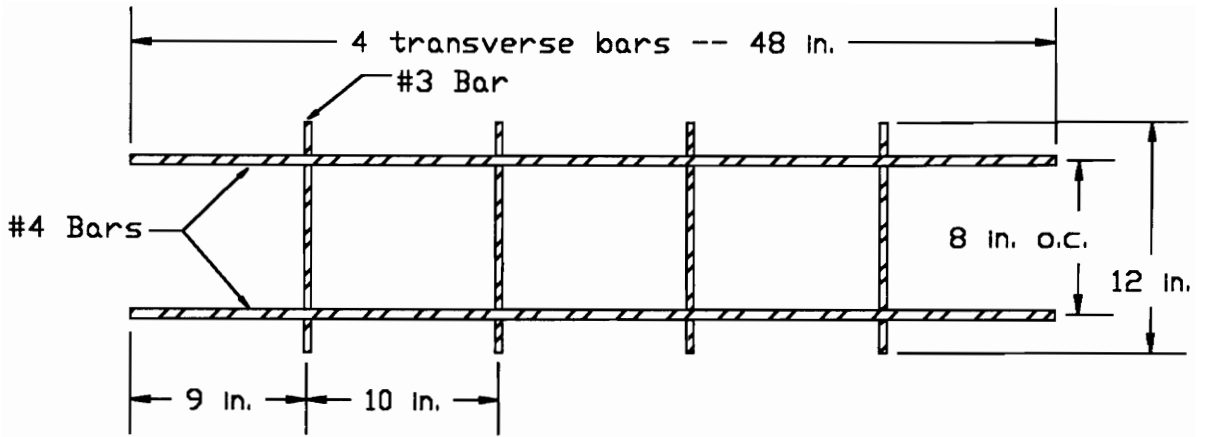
Bar Layout for Steel Bar Reinforced Beams
